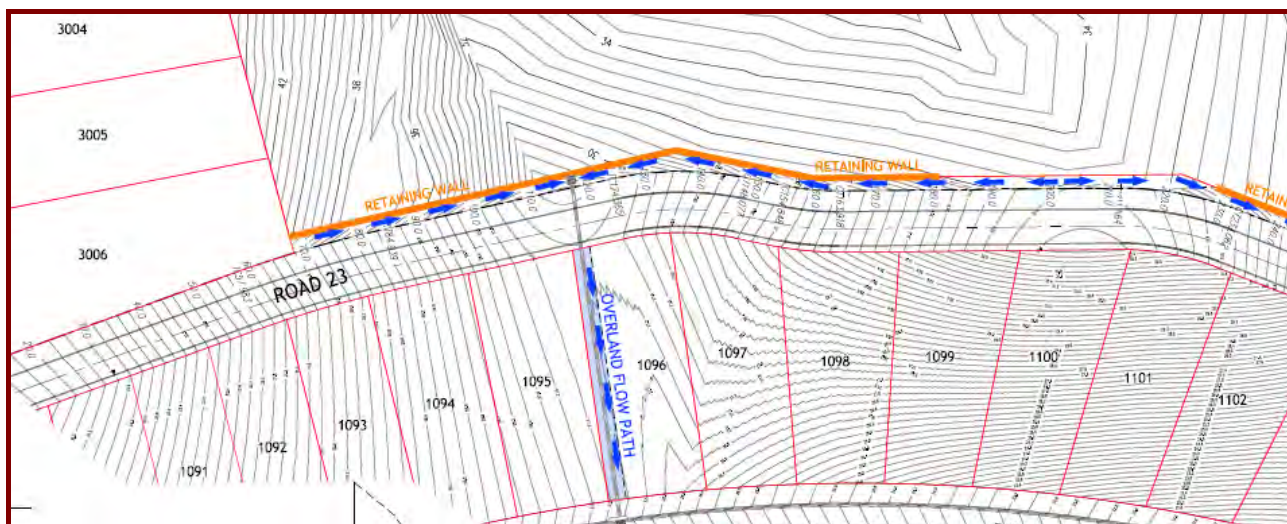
The approved road 23 with design contours for the site and adjoining contours.
